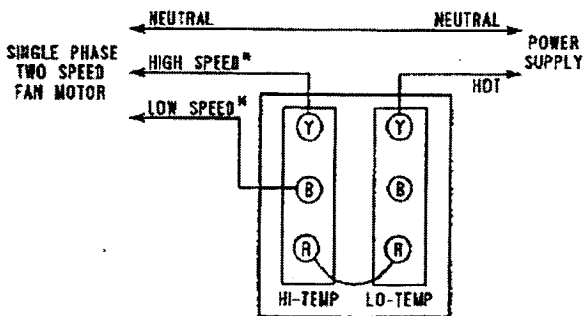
Wiring hookup and installation of the A28MA-1 Cooling Tower Fan Control with a forced draft cooling tower.
